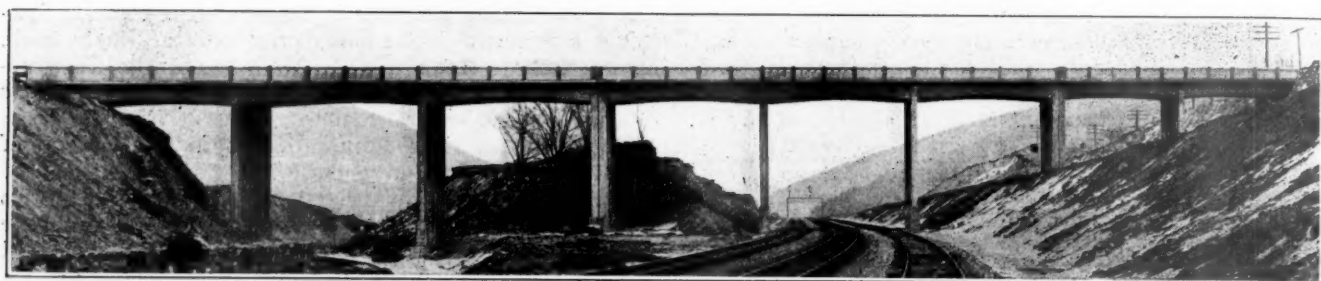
An Example of T-Beam Construction in a Concrete Viaduct
